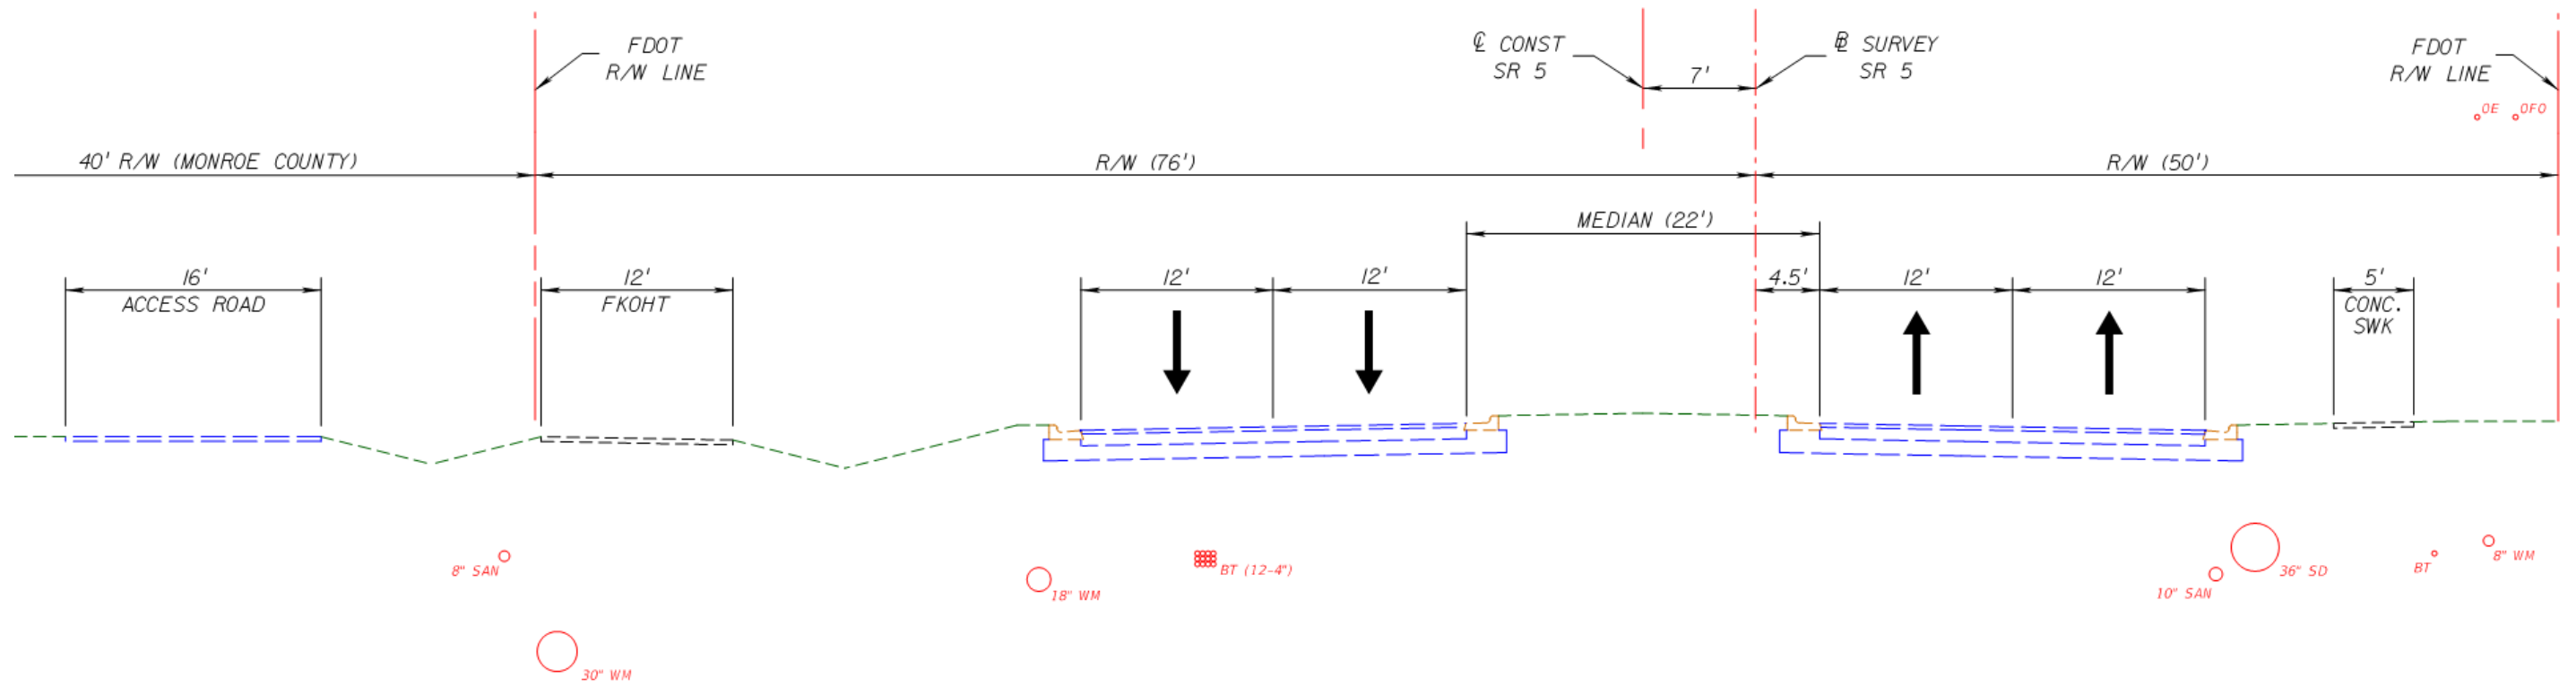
Location 5 (MM ±51.2) Existing Typical Section
